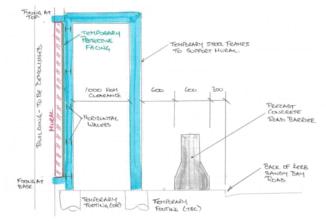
sketch of proposed method to support mural insitu during demolition and excavation works
